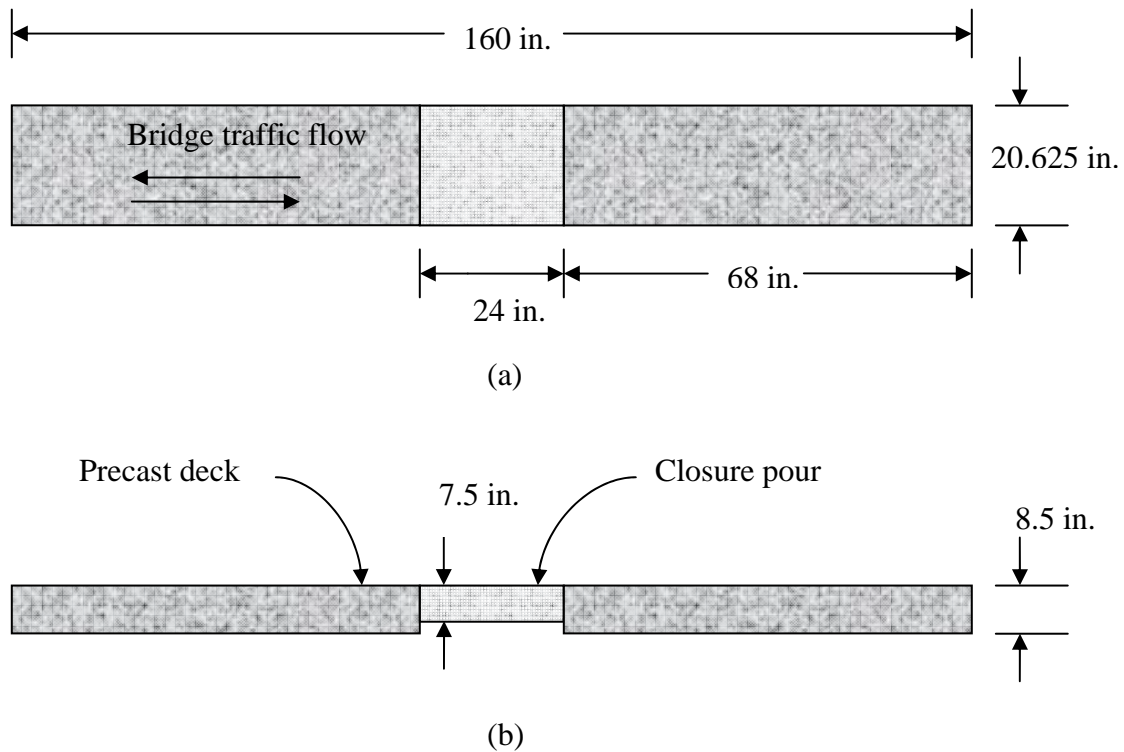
Plan View of Bridge showing orientation of laboratory beam strips
